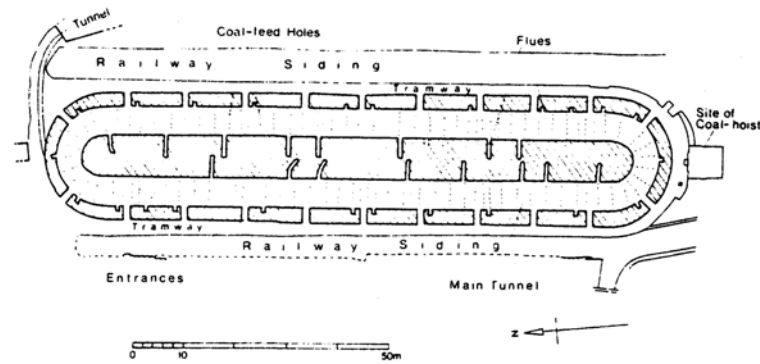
Langleiffe Hoffman Kiln—ground plan.
